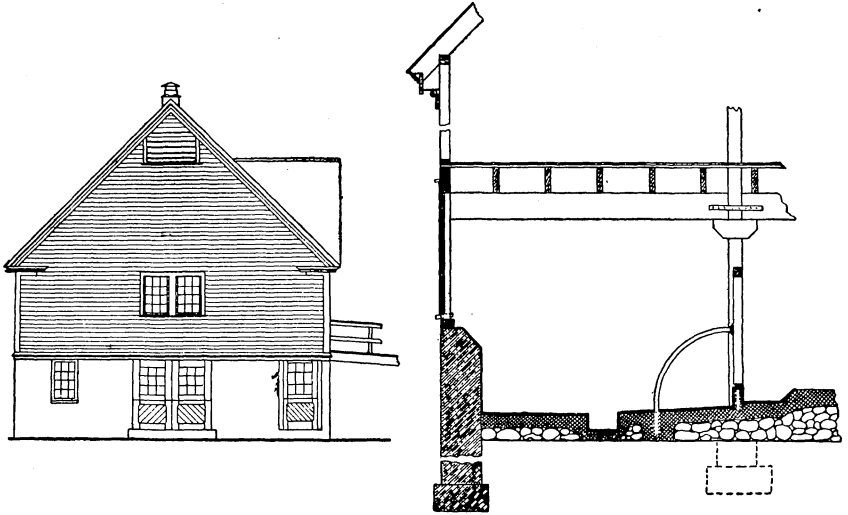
End elevation and detail of construction of stable shown in fig. 17.
